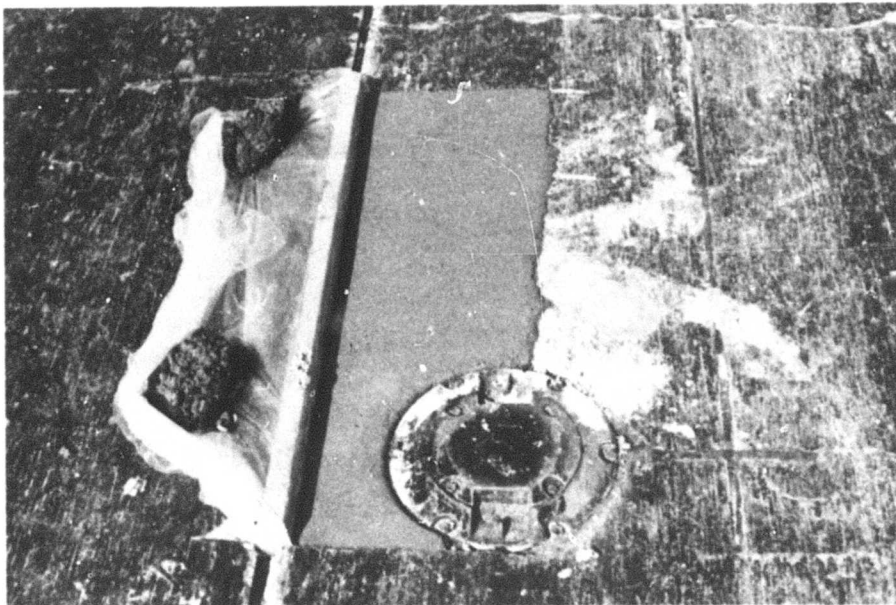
Wirand Concrete Patch Work Along Key Joint on a Runway at Major Airport
